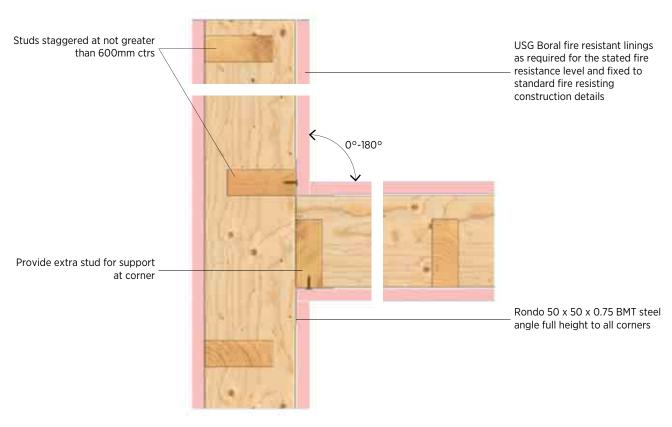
Staggered Timber Stud Wall - T Junction Detail
